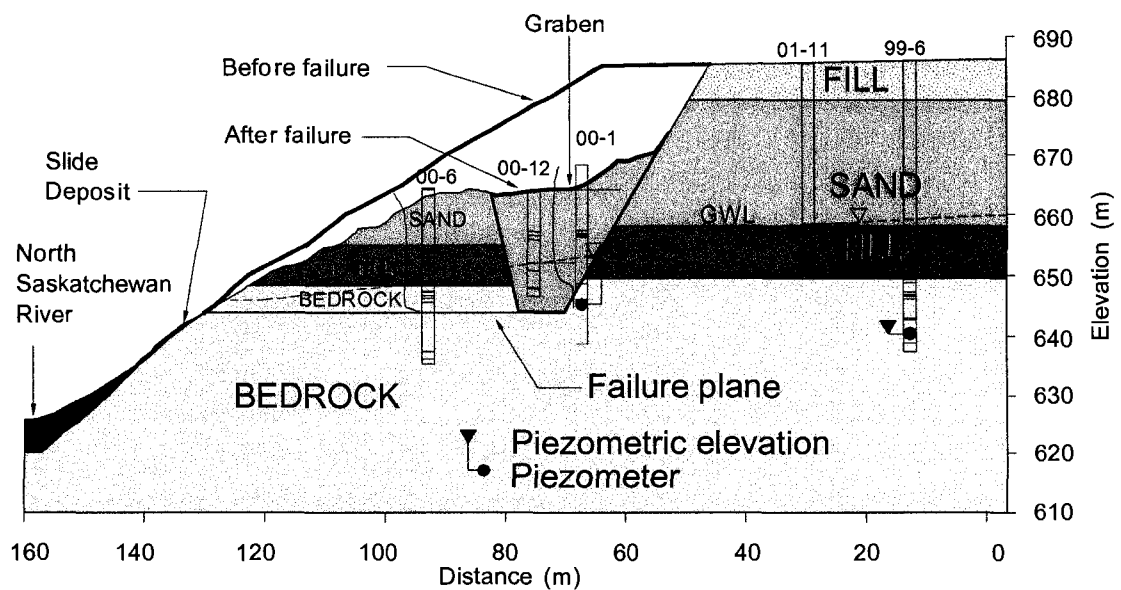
Pre-failure and post-failure cross-section of the Whitemud Road Landslide
